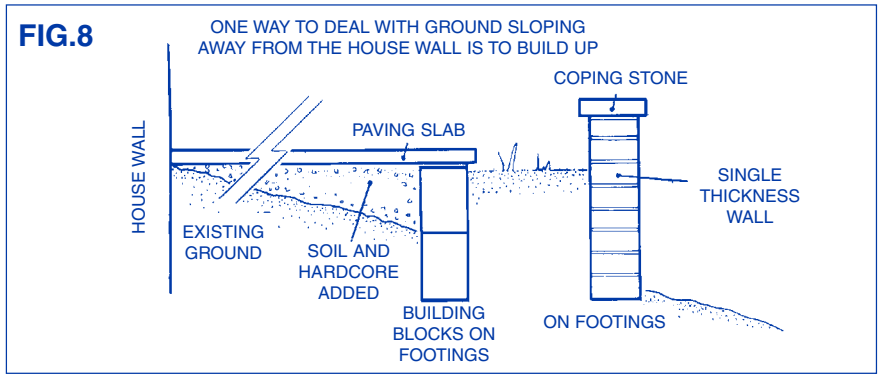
& 9 show other ways of building retaining walls where the ground slopes away from a house wall and FIG. 10 shows how to deal with ground sloping towards the house.
